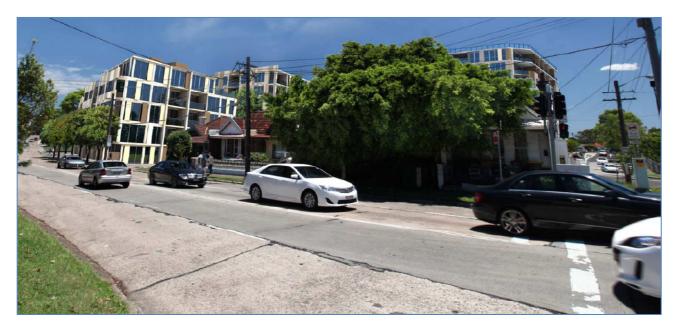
Photomontage from corner of Old Canterbury Road and Longport Street
